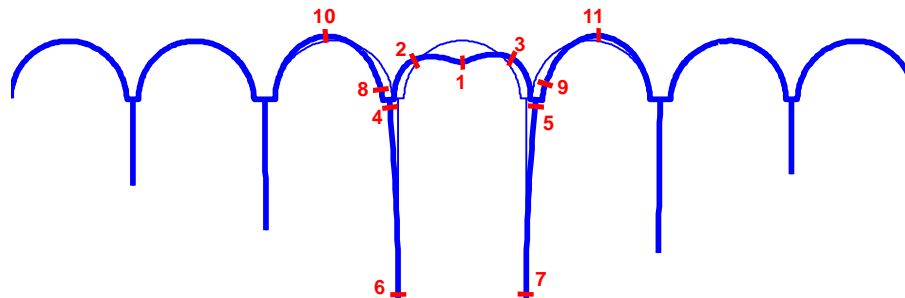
Collapse configuration under rail traffic load and monitored cross-sections.
